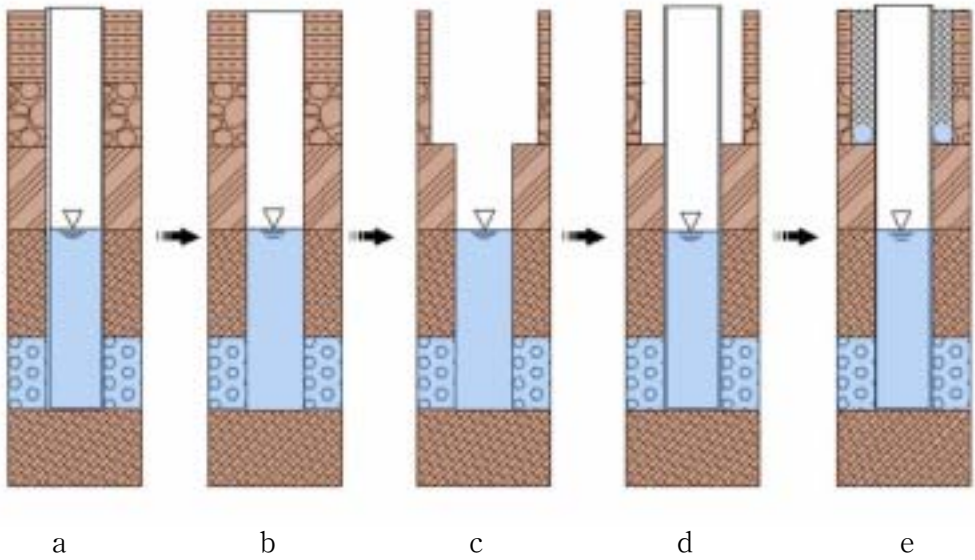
Diagram of expansive packer grouting(I) (a: before repairing, b: casing conduct, c: widening a well d: installing casing, e: grouting of surrounding gap)
